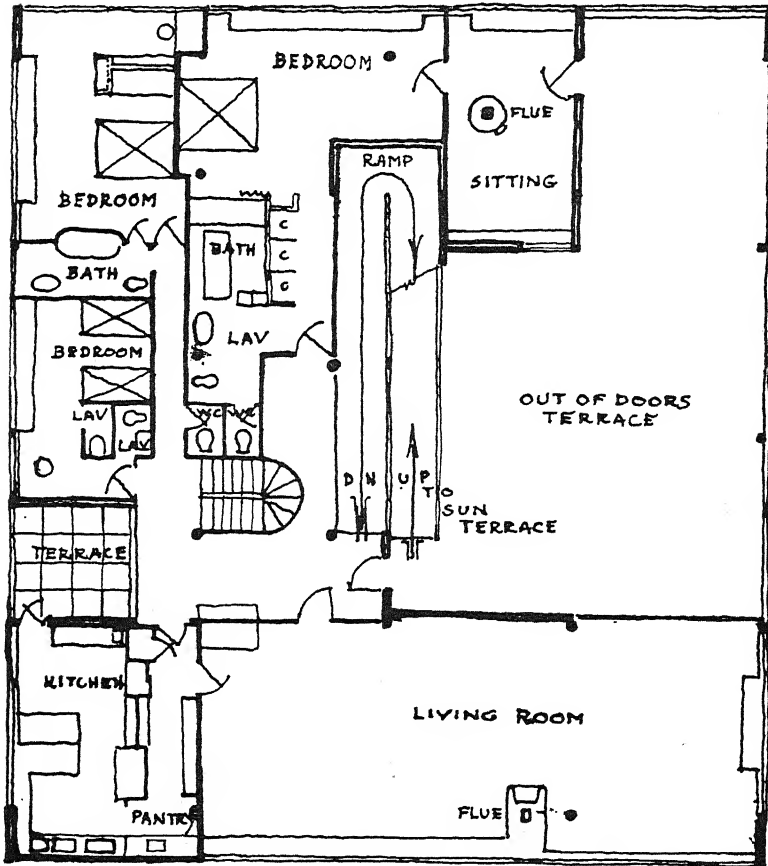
Main floor plan (upper ground) of a house at Poissy by Le Corbusier and Jeanneret. Structural supports are established at suitable intervals, and partitions and wall openings are freely established, being supported on the floor slab.
